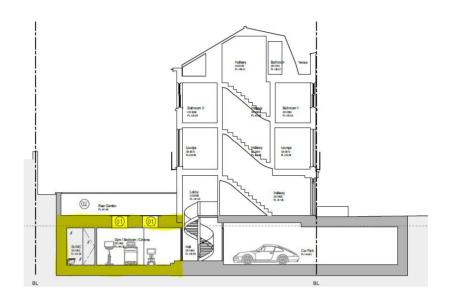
PROPOSED GROUND FLOOR (BASEMENT BELOW HIGHLIGHTED)
